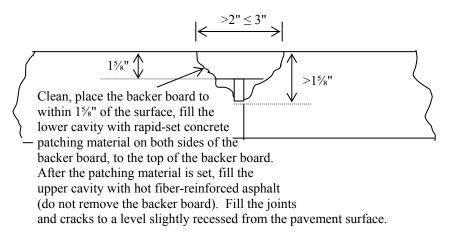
TYPE B, SEALING PCCP, SPALLED JOINTS AND CRACKS (>2" ≤ 3" wide, >15/8" deep)
